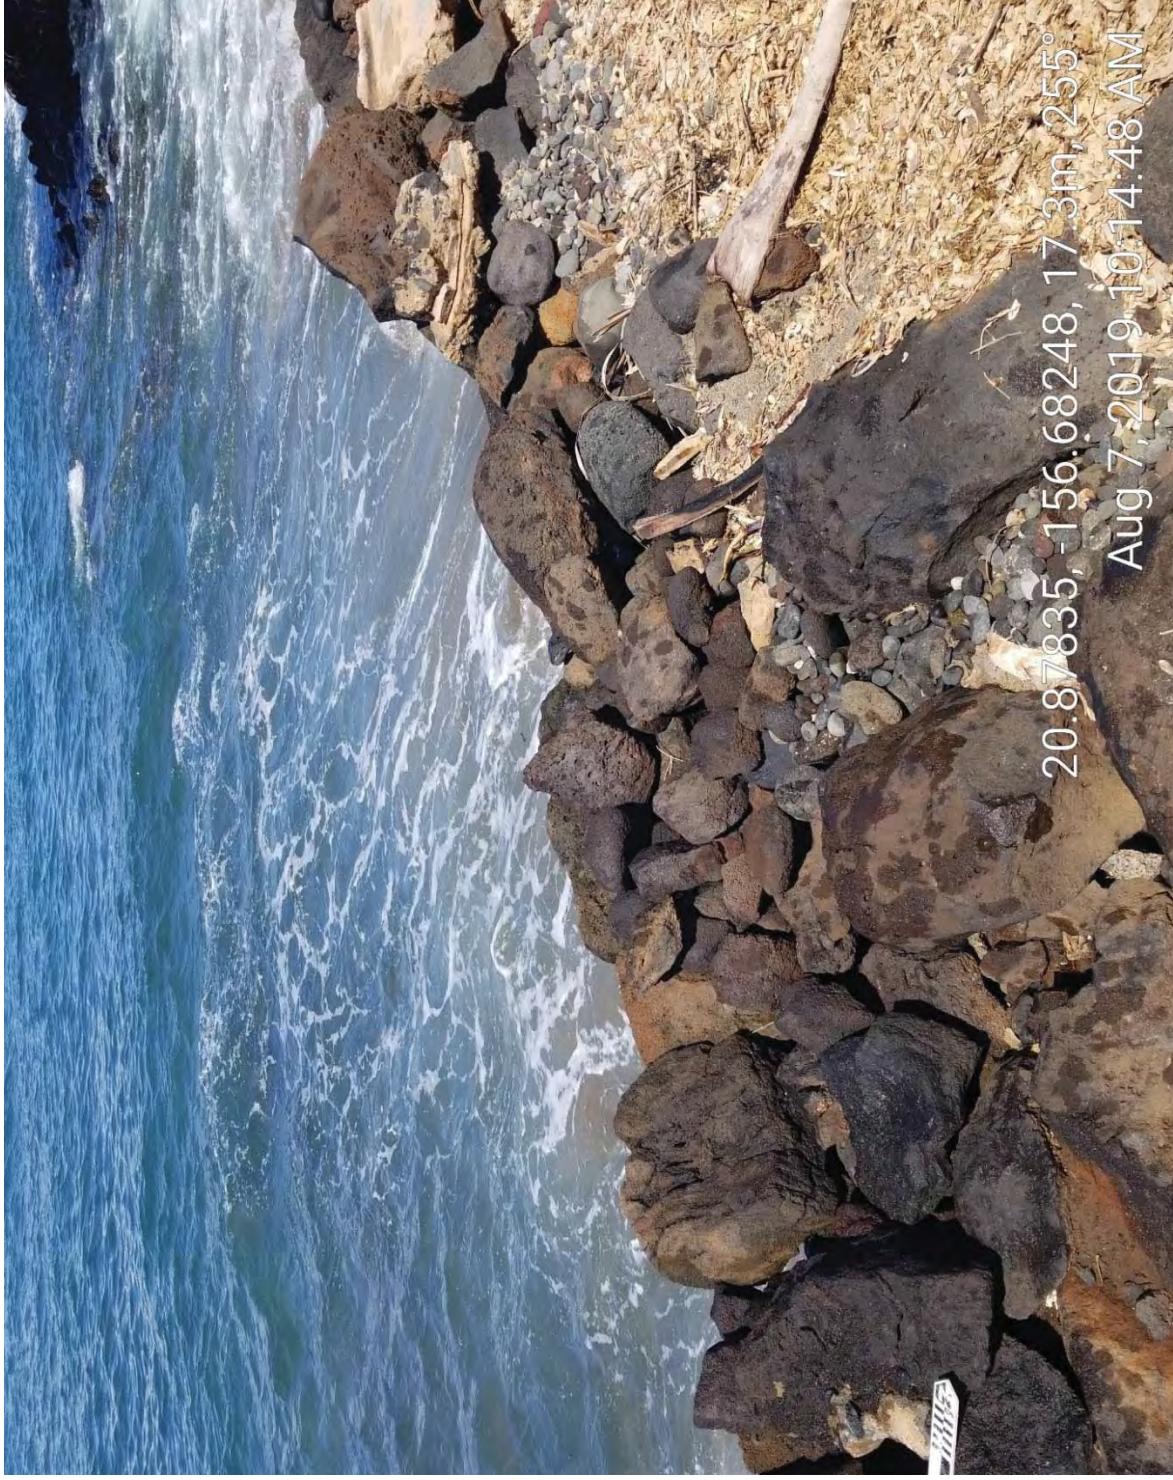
Photographic View of Continuation of Area Exhibiting Modifications to the Area 2 Seawall. View to Southwest.
